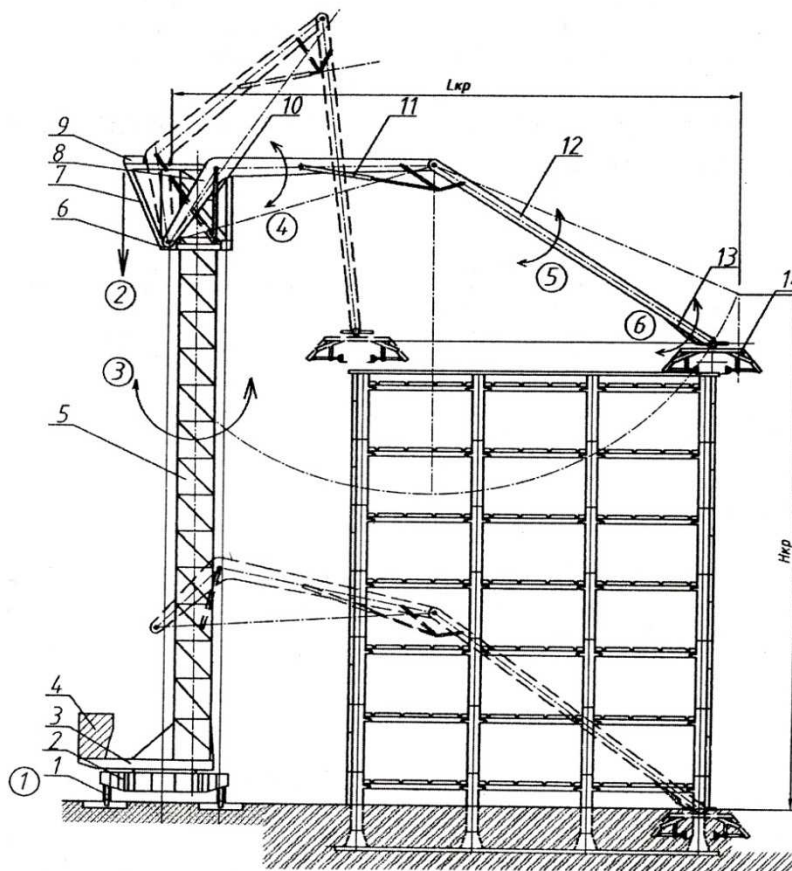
Crane-manipulator, MSUCE; 1 – mechanism of movement; 2 – support-rotating device; 3 – rotating platform; 4 – counterweight; 5 – tower; 6 – lifting column mechanism; 7 – lifting column; 8 – hydraulic drive of crane; 9 – counterweight; 10 – boom; 11 – hydraulic cylinder of the boom; 12 – handle; 13 – hydraulic cylinder of the handle; 14 – gripper.
